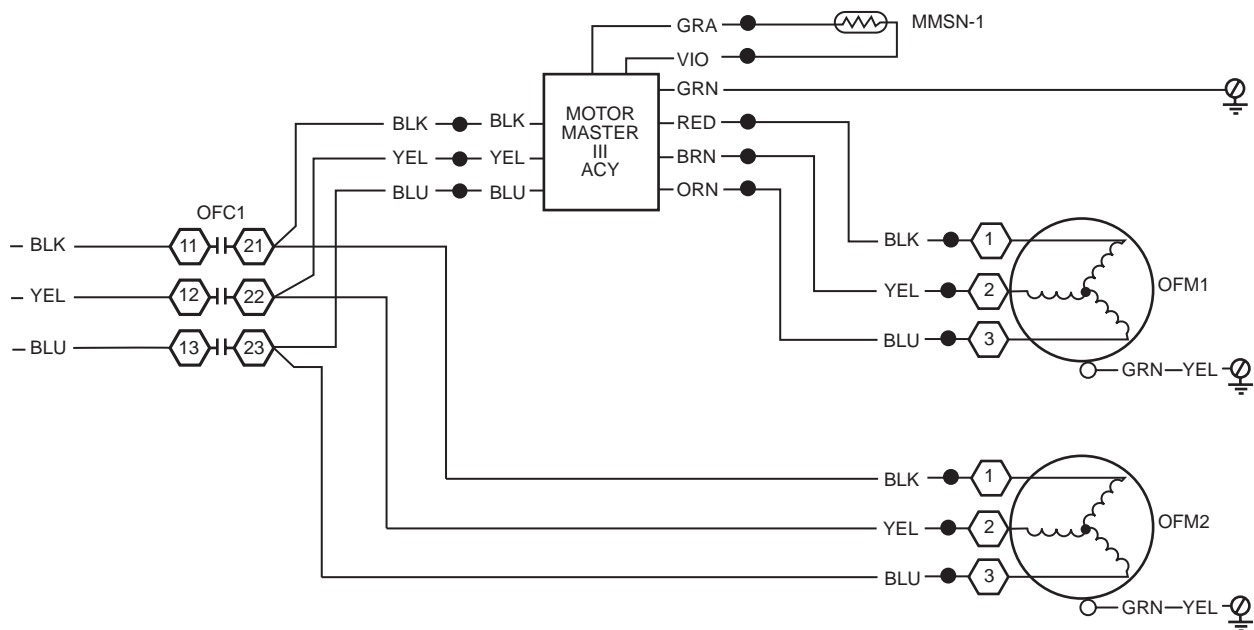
Motormaster® III Device Wiring, 48/50EJ,EK,EW,EY038-068 — All Units Except 575-V Units
